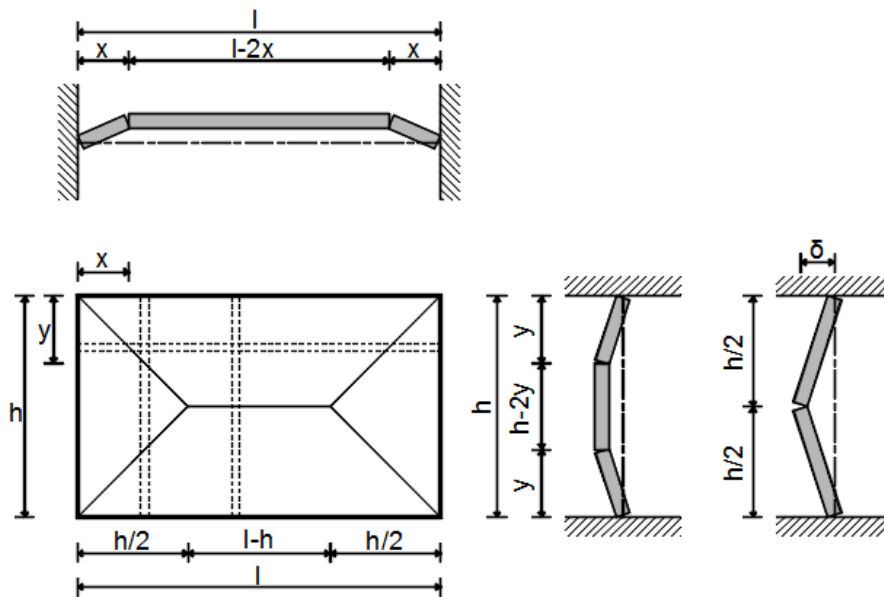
Crack pattern in infill wall and strips model by Dawe and Seah (1989)
